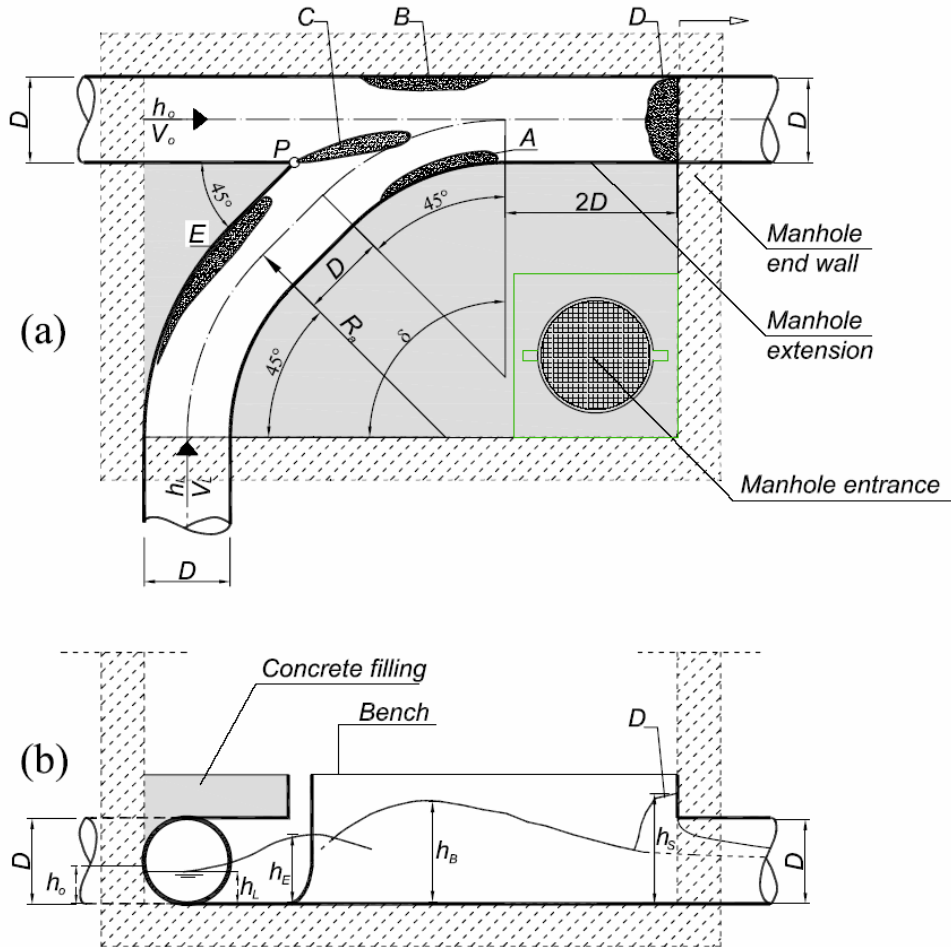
Definition sketch of junction manhole (a) Plan with shock waves A, B, C, D and E, (b) Section.
